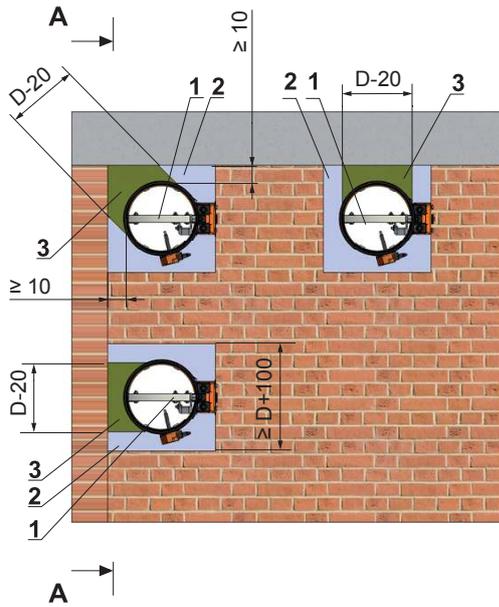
Solid wall construction - installation next to wall, ceiling - mortar or gypsum and mineral wool
